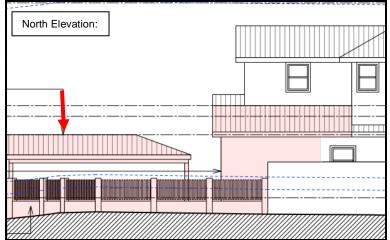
Architectural excerpt indicating the side openings of the proposed carport from the north elevation
